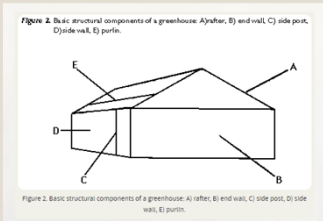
Basic structural components of a greenhouse: A) rafter, B) end wall, C) side post, D) side wall, E) purlin.
